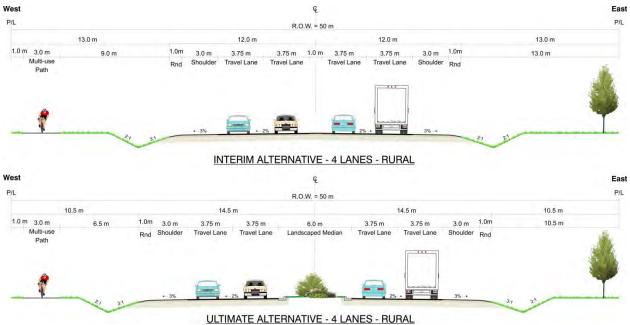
PIC 2 TYPICAL CROSS-SECTION LAUZON PARKWAY COUNTY ROAD 46 TO HIGHWAY 3
